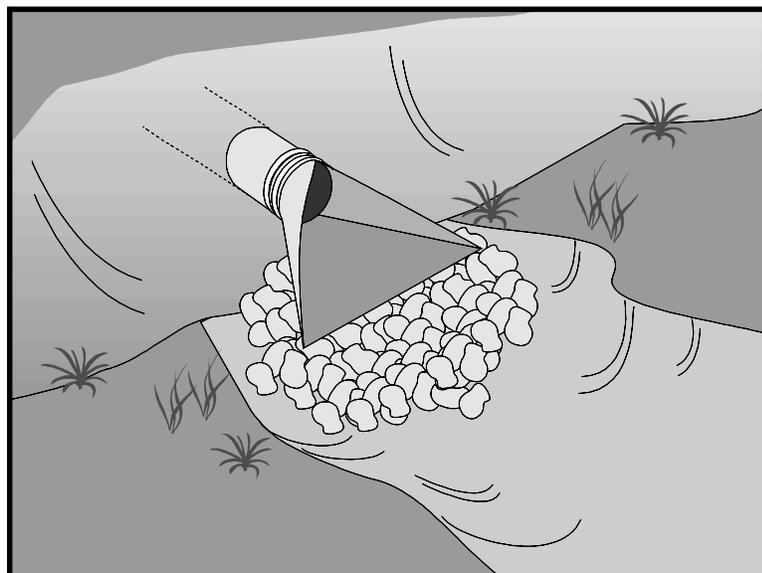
illustrates a typical flared culvert end section. For additional detail and dimensioning see NDOT 2001 Standard Plans, Pages R-14 & R-5.
